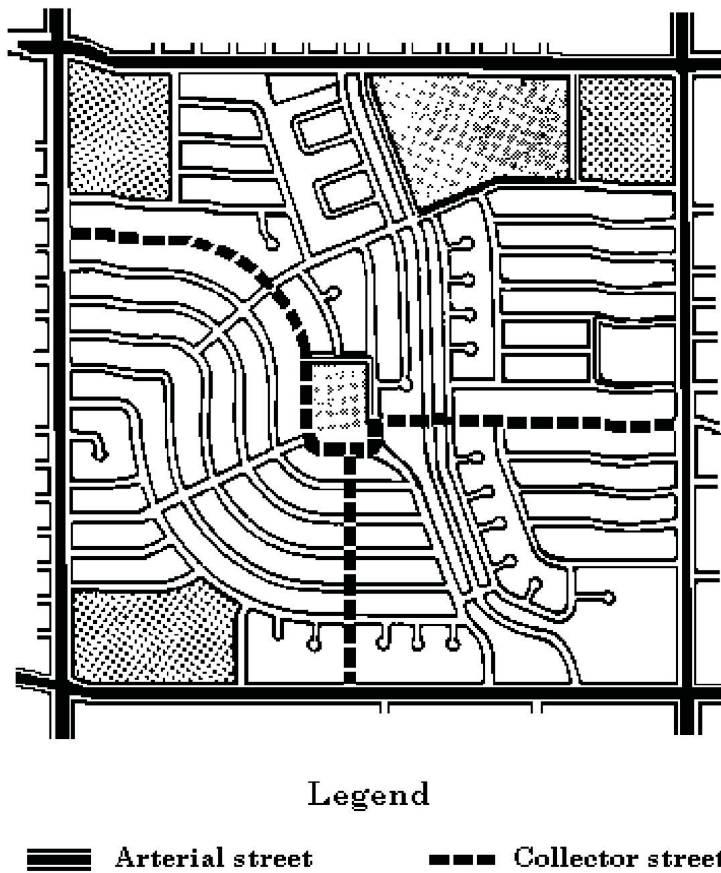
(a): Typical plan view and cross sections of Urban Arterial, Collector and Local streets (widths in meters)
